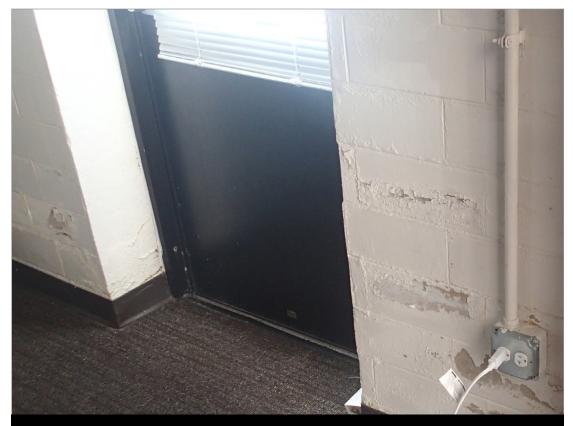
Peeling Wall Paint in Room 121 Source: The DoD OIG.
